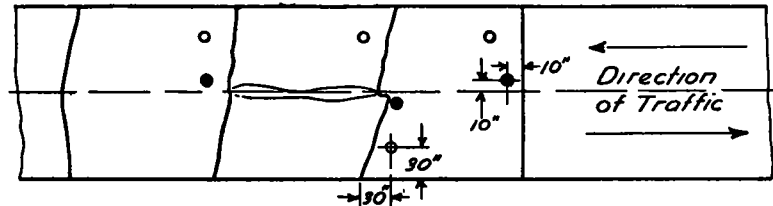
Typical Locations of Void Filling and Lifting Holes at Transverse Joints and Cracks ●, Void filling hole; ○, lifting hole.
